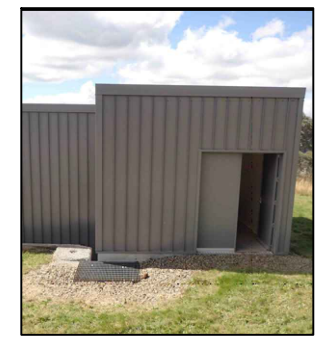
PHOTO TAKEN FROM SOUTH-WEST OF SITE
